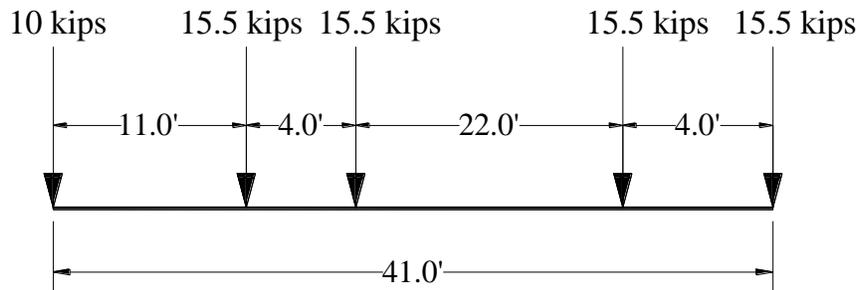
Proposed New York State Legal Trucks for bridge rating.
